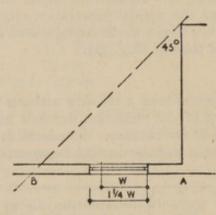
PLAN SHOWING EXTERNAL RETURN WALL. Window between A and B to be widened by $\frac{1}{4}$ except that no window more than 50 ft. from A need be increased.
